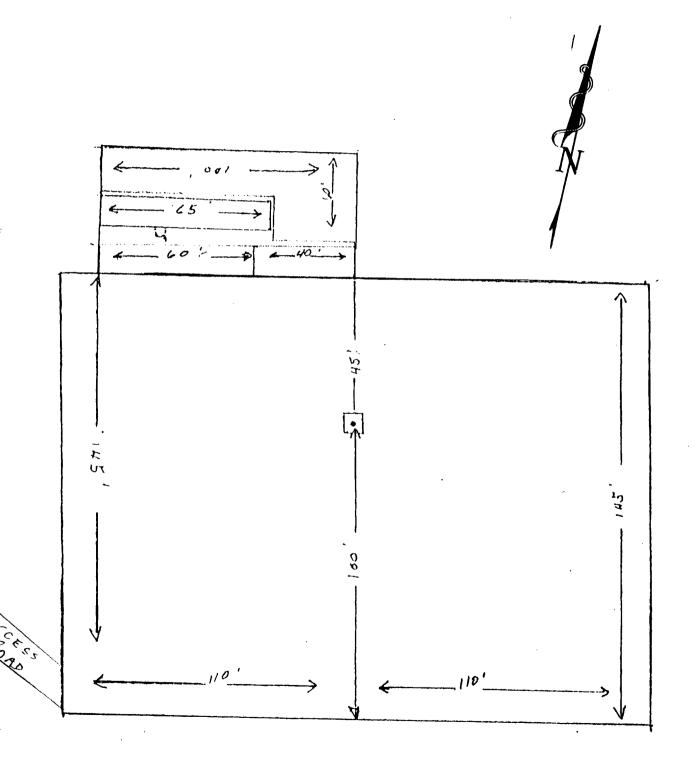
EXHIBIT "D" SEELY OIL CO. E-K Penrose Sand Unit, Well No. 701 Pad & Pit Layout
